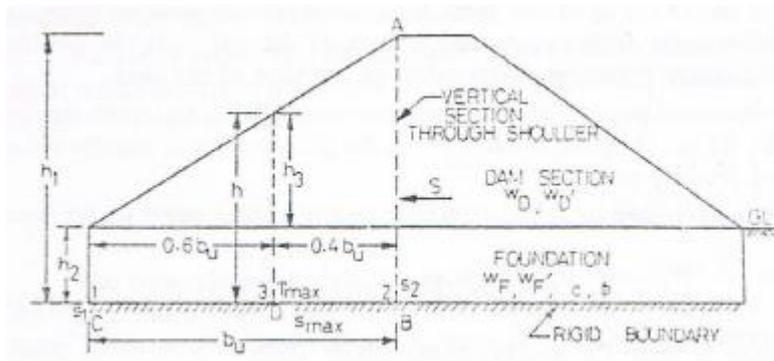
shows the upstream portion of an earth dam on a weak foundation.
